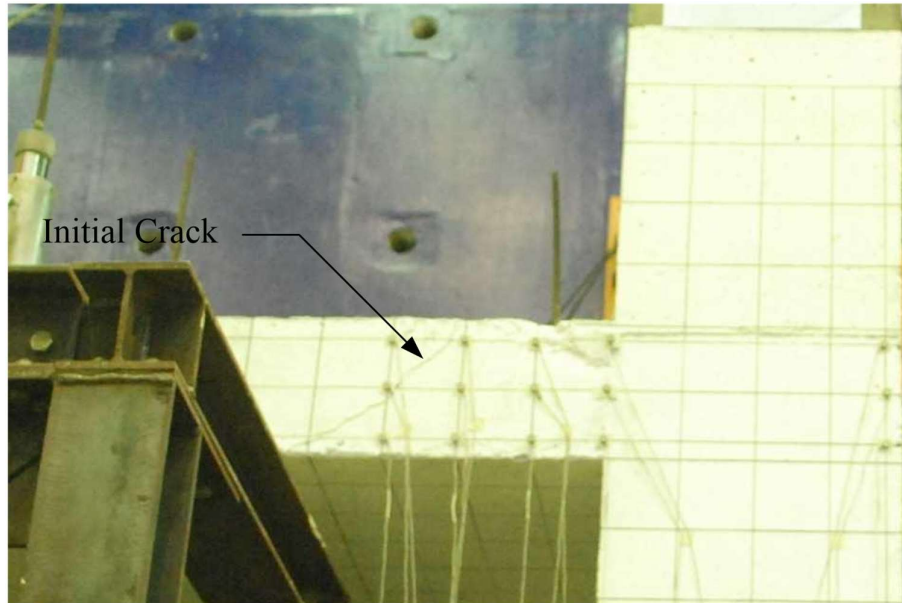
Initial Crack on the North Face of the Slab of Specimen G3
